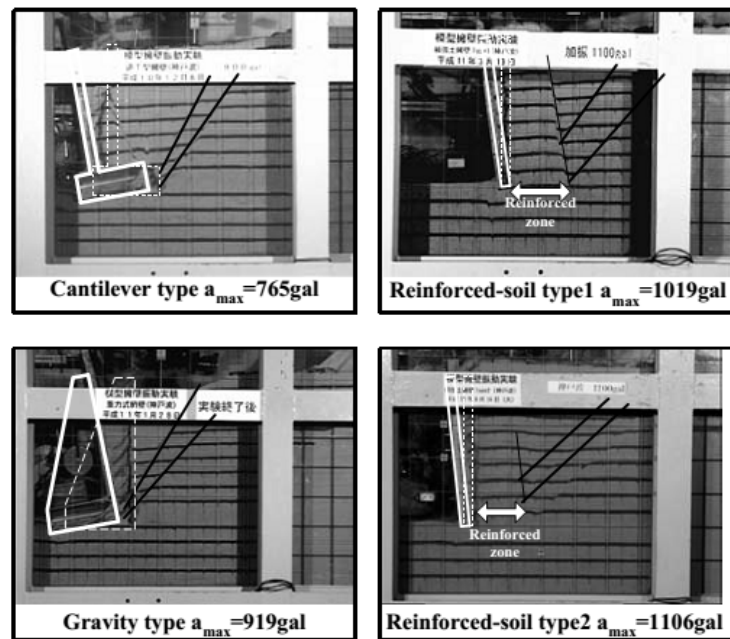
Final Wall Geometry, Soil Deformations and Internal Soil Failure Planes of Model Wall Systems (Watanabe *et al.*, 2003).
